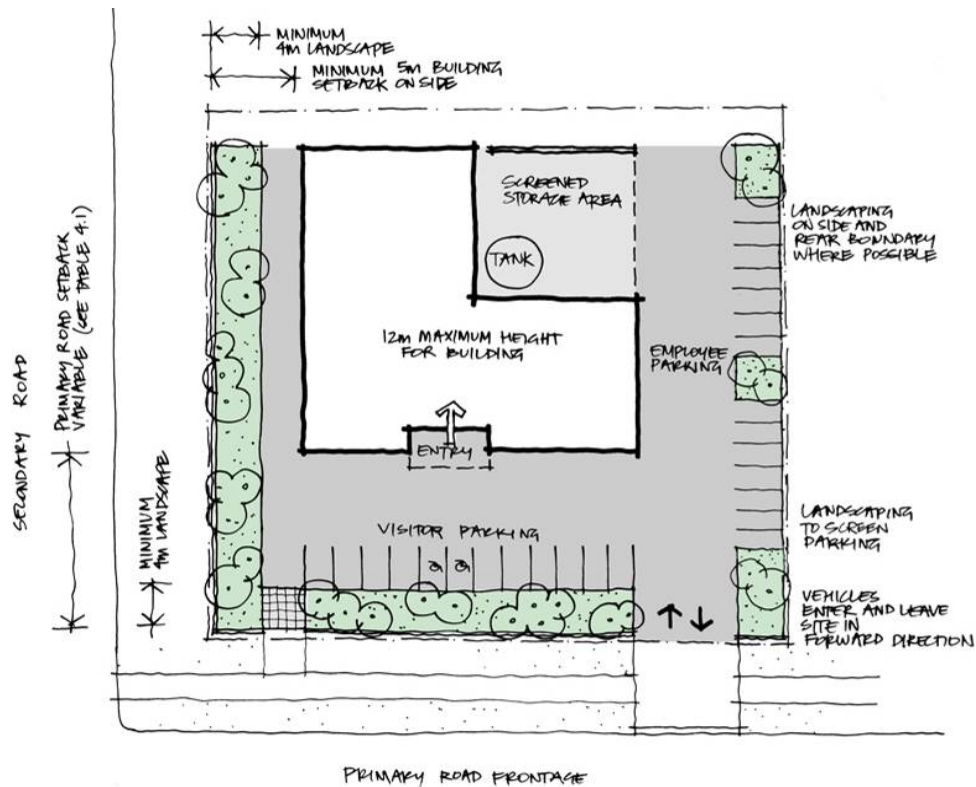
Illustration of Building Setbacks – Smaller Site (Cross Section)
